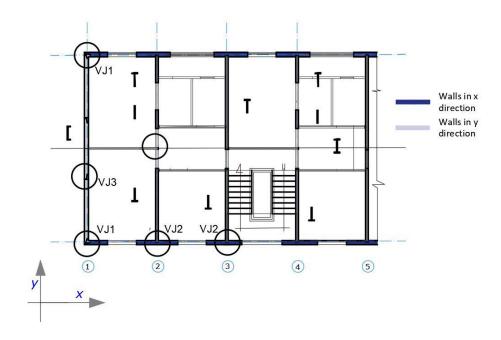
Floor plan of an Albanian LPB showing the locations of vertical joints VJ1, VJ2, and VJ3 (source: AQTN, 1999).⁵¹
